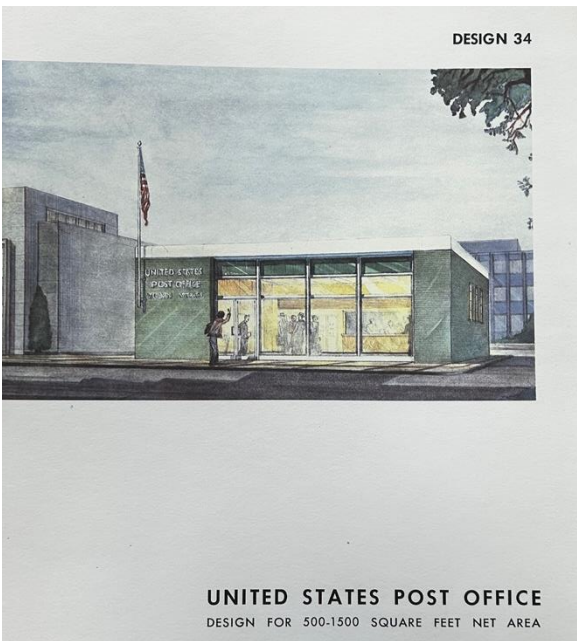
Thousand Series design drawing from Building Design Guidelines. Design 34 is a minimal design with most of the ornamentation revolving around the use of blond running bond brick veneer on the front elevation with vertical picture windows. A unique feature on Design plate 34 is the attached flagpole. (USPS Corporate Library, 1959).
